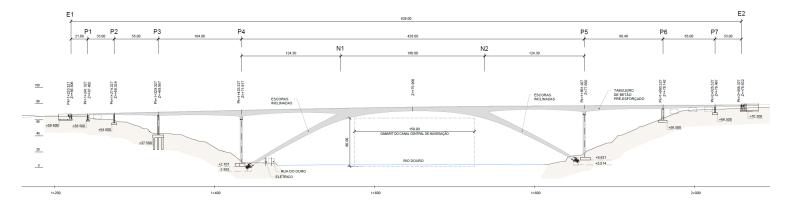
Elevation of the new Bridge over the Douro River Click on the image to open it in a higher resolution
